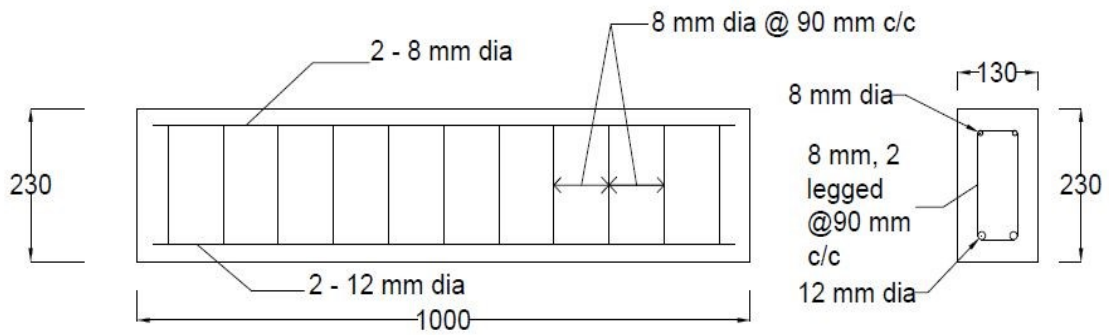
2 :Cross-section and reinforcement detailing of the beam used in the study
